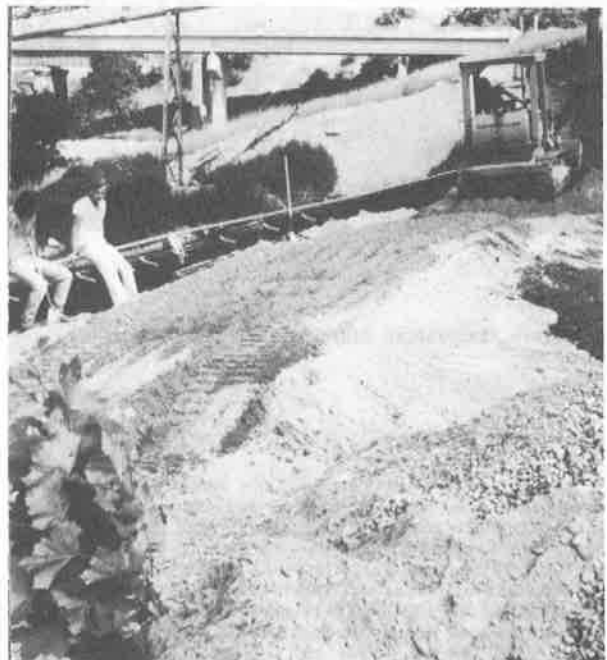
SPREADING BACKFILL, TEST WALL NO. 3
